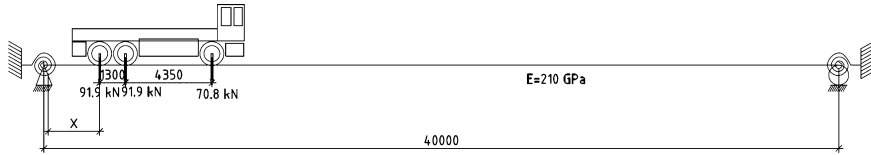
Load from the test truck and model of the bridge over the Leduán (dimensions in mm)
